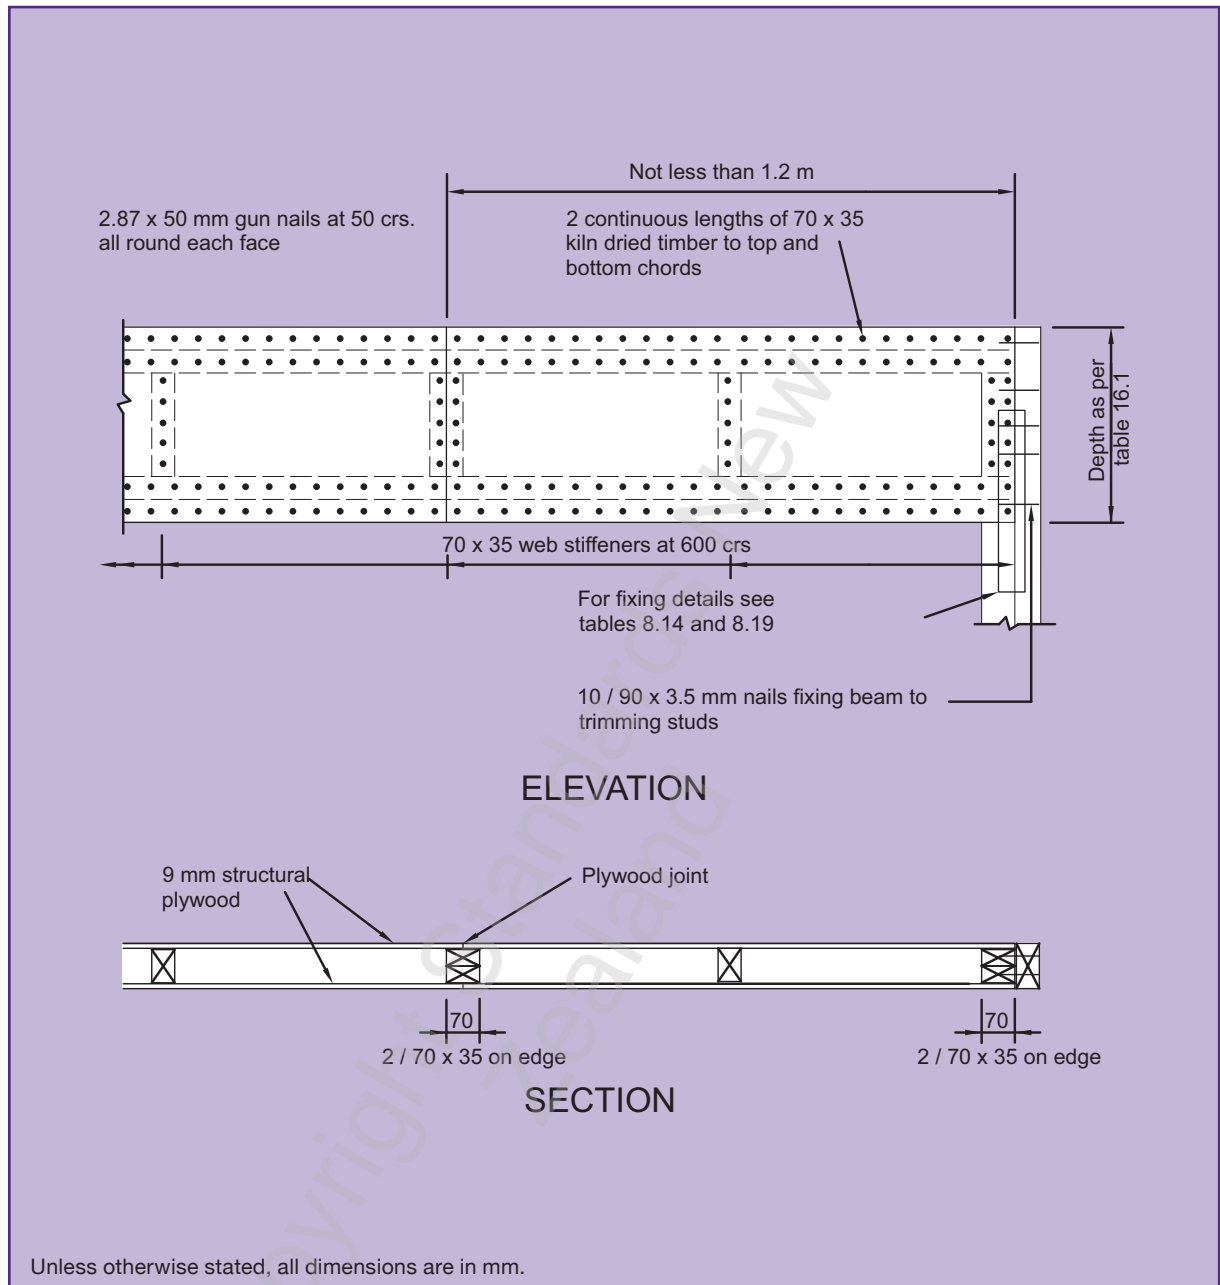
Built-up plywood box beam lintel – Elevation and longitudinal section (see 8.6.1.7)
